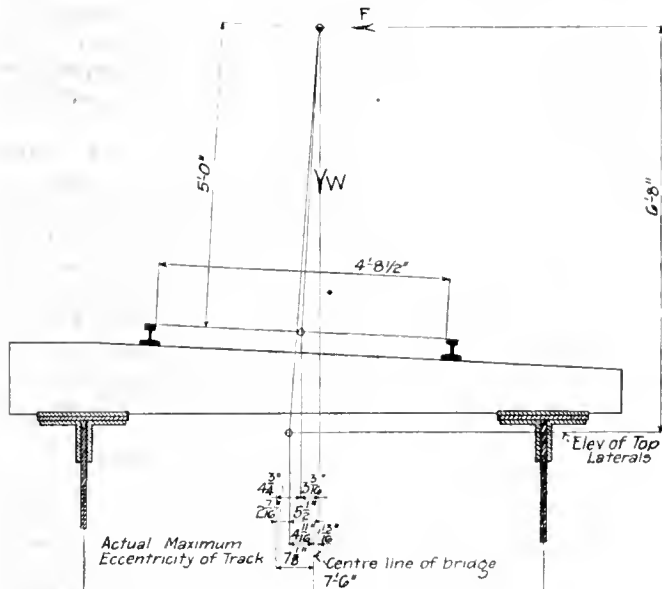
Standard Floor for Deck Bridges—Without Steel Floor Beams and Stringers.
